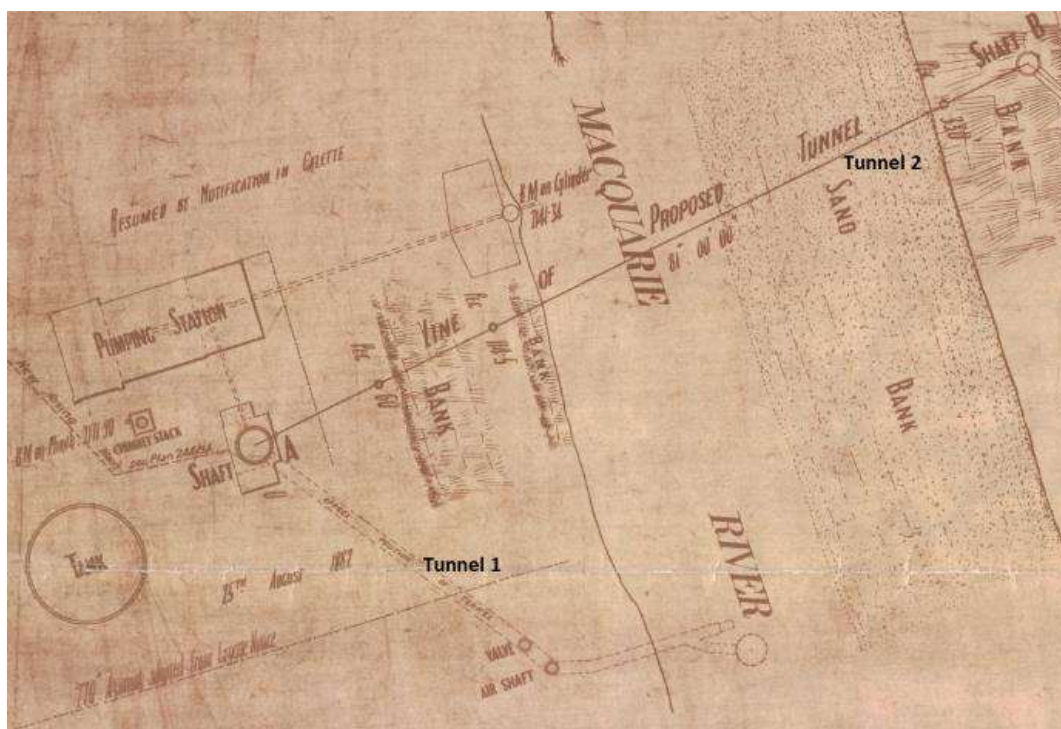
Plan of the Bathurst Groundwater Tunnel Built from Shaft A to Well 2
